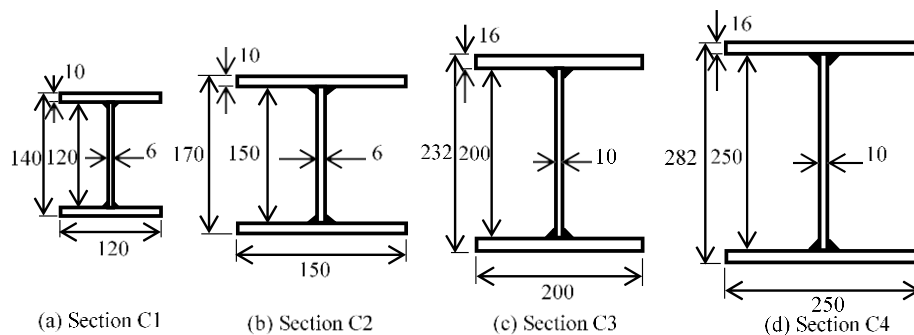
Nominal cross-sectional dimensions of S690 welded H-sections
